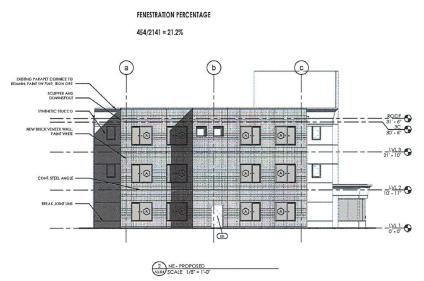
Cowan Road elevation, faced with brick, not stucco. Staff recommends a canopy over the door and additional glazing around the door.
